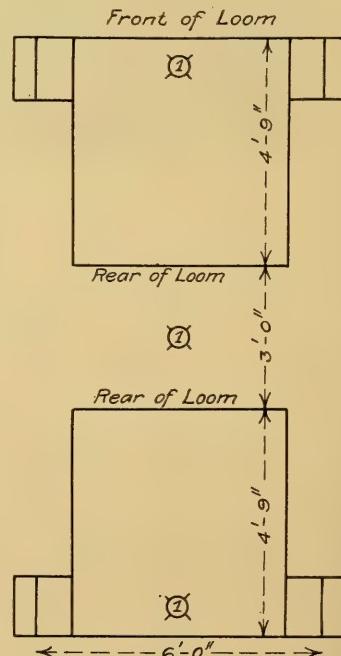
PLAN OF LIGHTING LOOMS IN NEW MILL, LAMPS FIXED.
